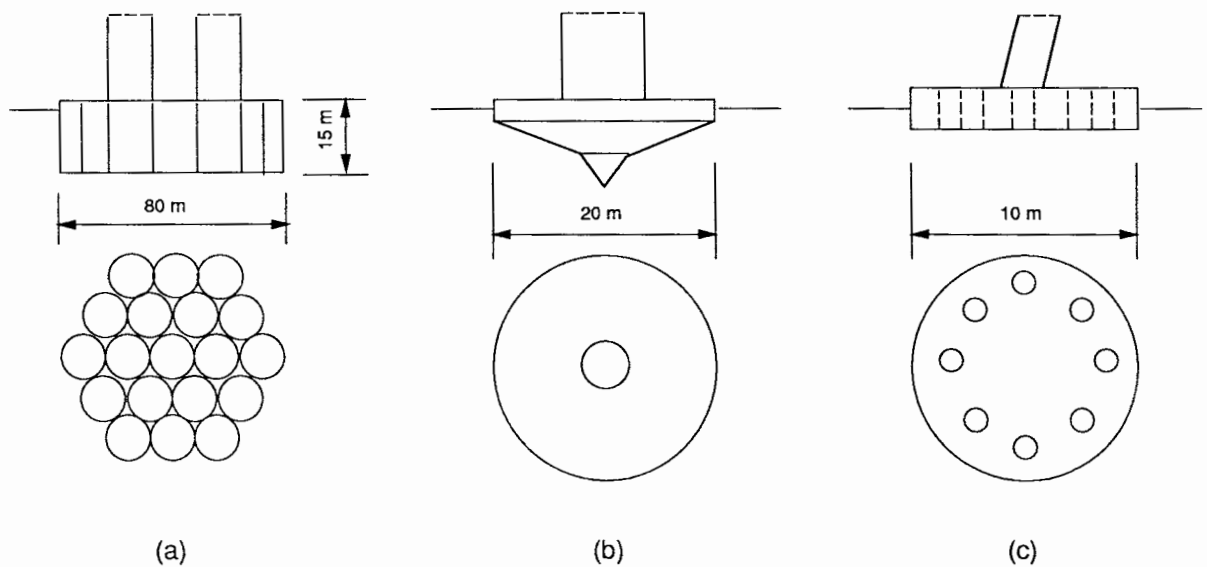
Examples of bearing offshore foundations: (a) Gravity foundation, (b) Spudcan footing, (c) Mudmat for piled structure.
